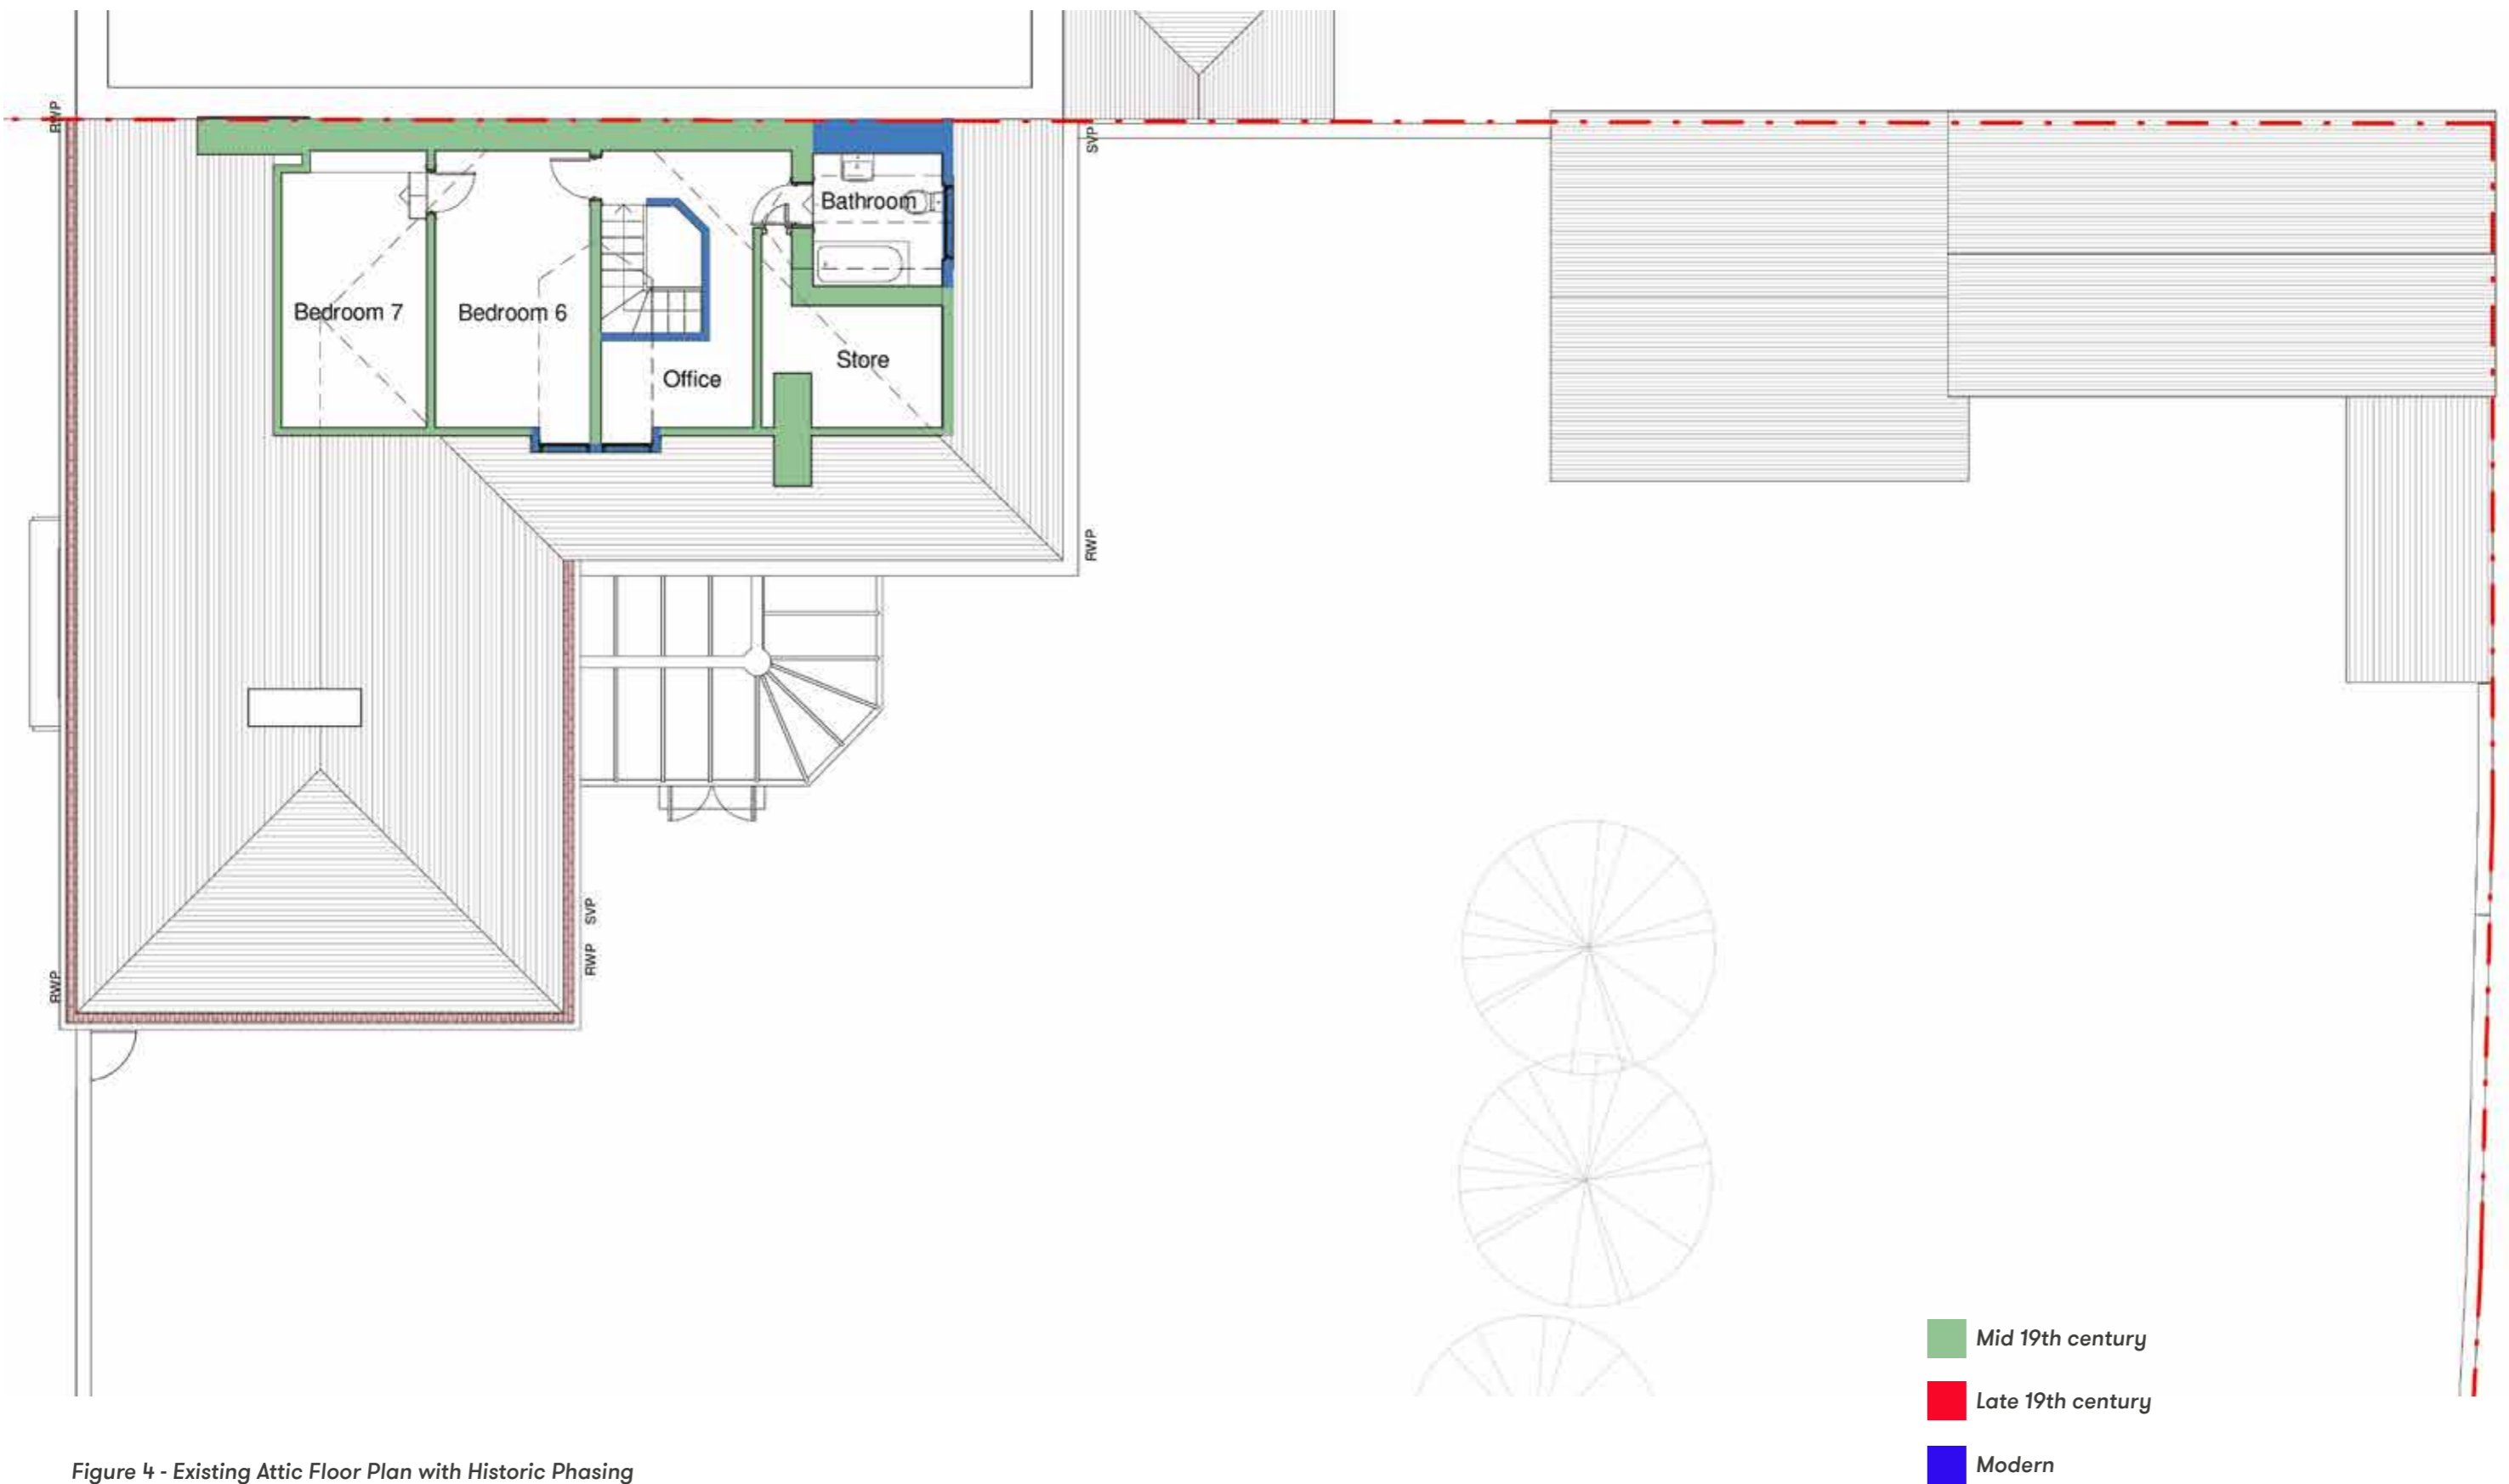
Existing Attic Floor Plan with Historic Phasing
